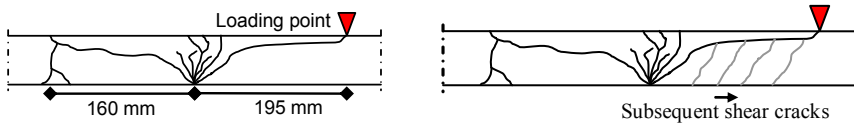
, c Schematic fracture pattern, directly after failure (left) and development of shear cracks (right).
